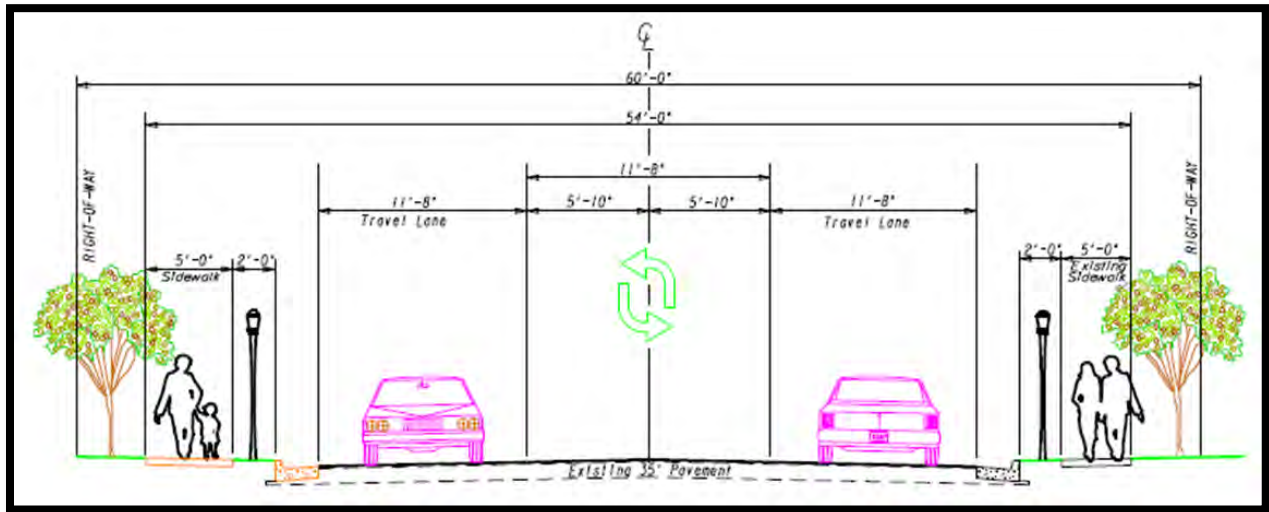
Proposed Typical Section – Alternative 1 – West First St. from Montgomery Ave. to Georgia Ave.
